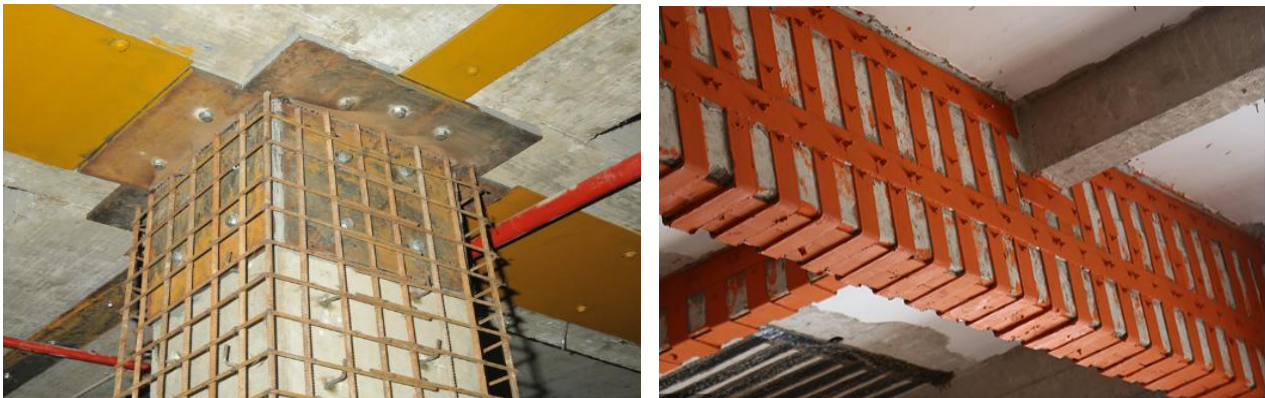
Application of Sticking steel plate of reinforcement concrete beam and slab
